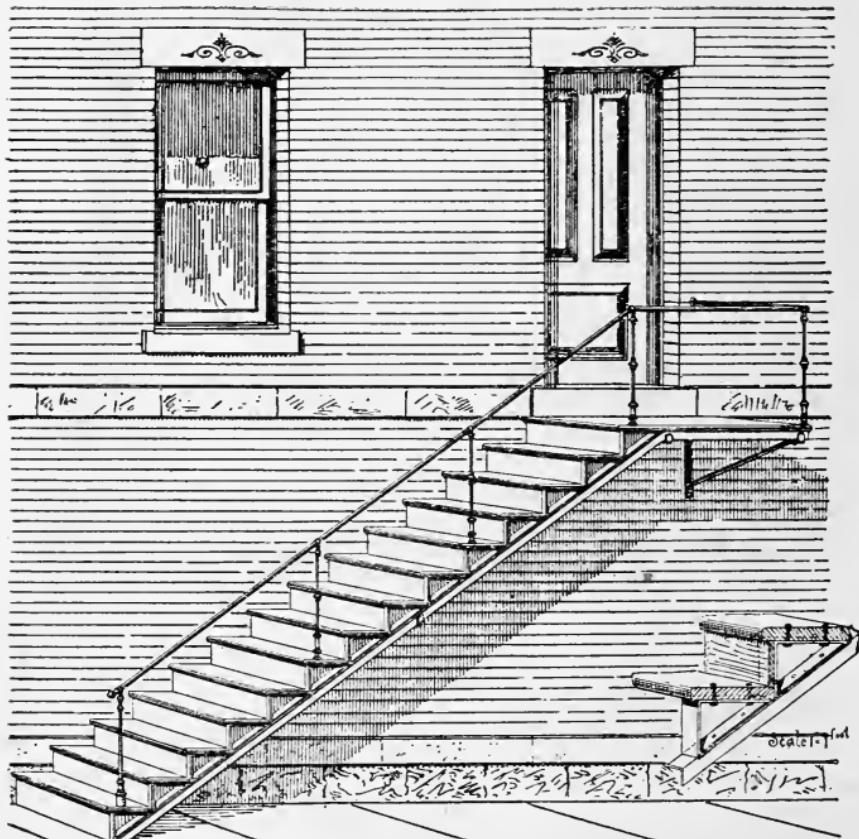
Plate J. Stairway Two inch wrought angle iron. Stringers with cast Brackets for wood steps.
